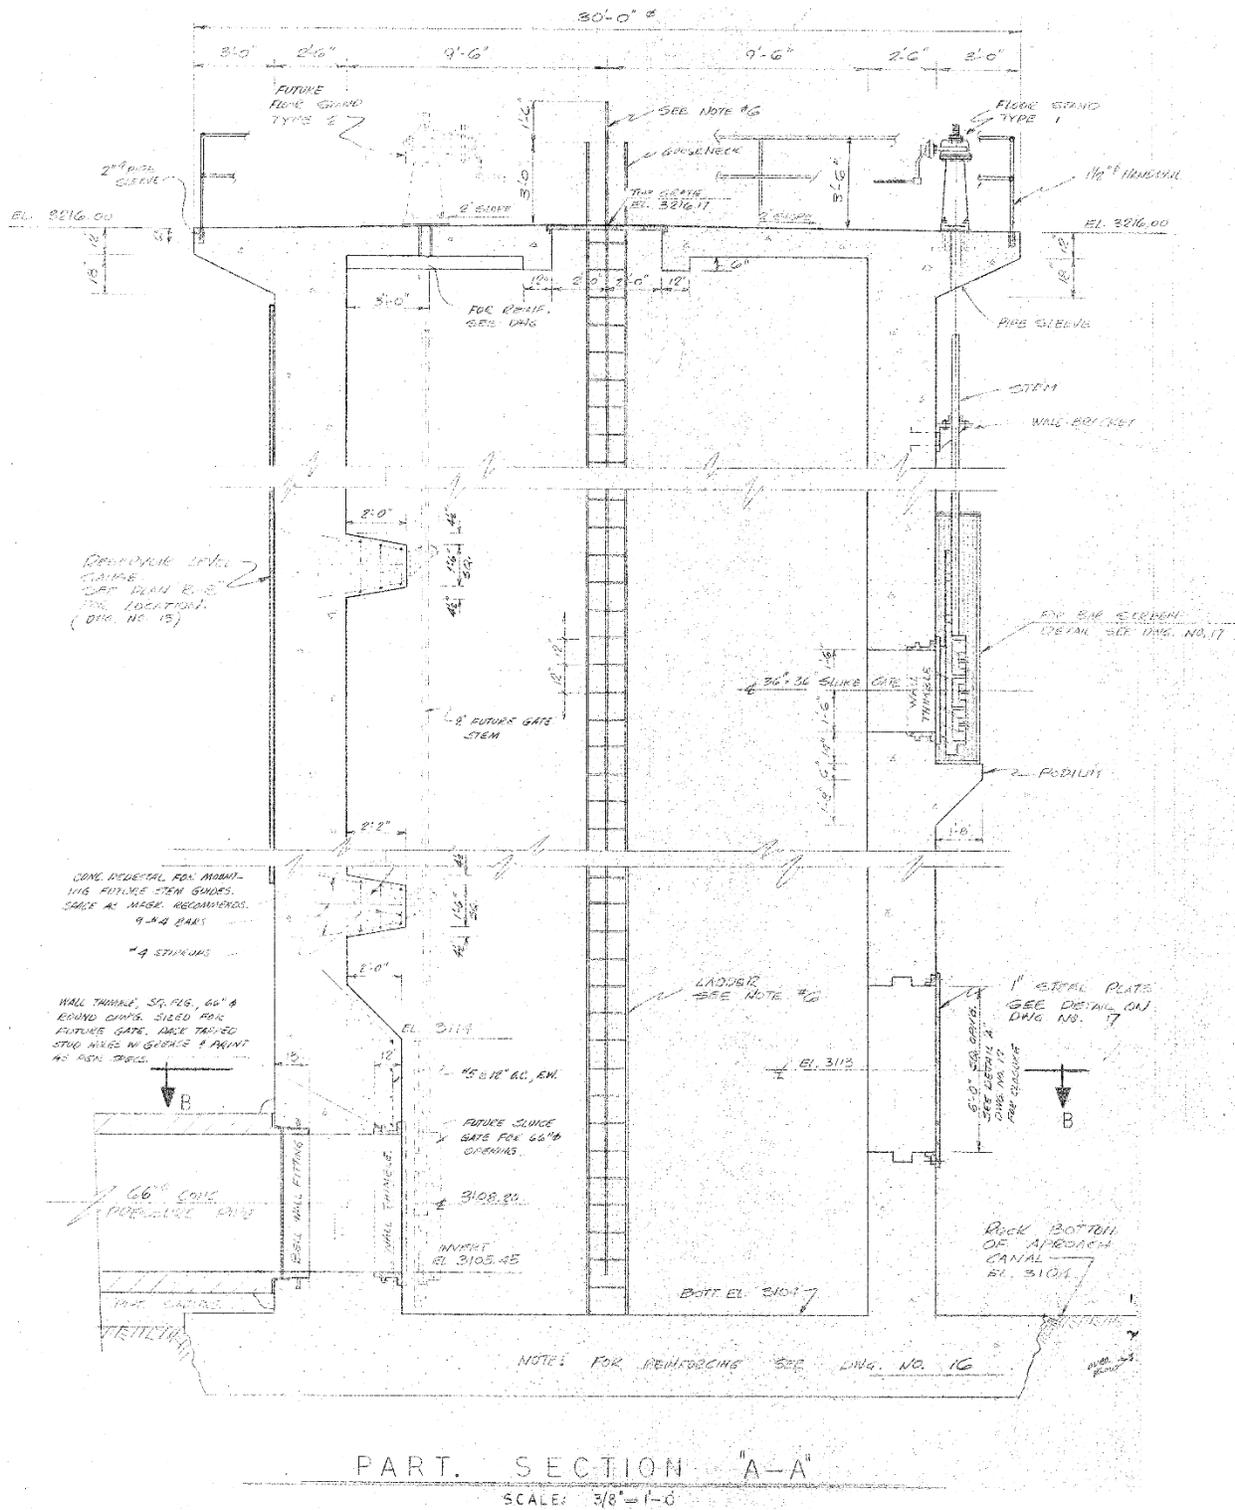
Intake Tower Vertical Section View (from 1975 plan drawings)
